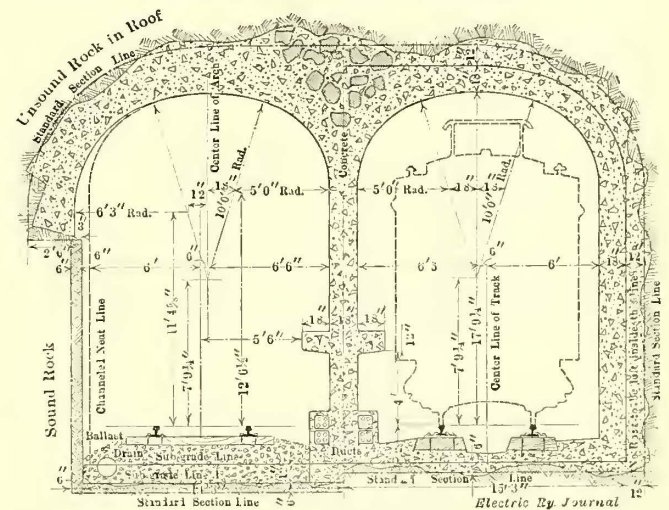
Montreal Tunnel—Typical Tunnel Section—Bad Rock in Roof
